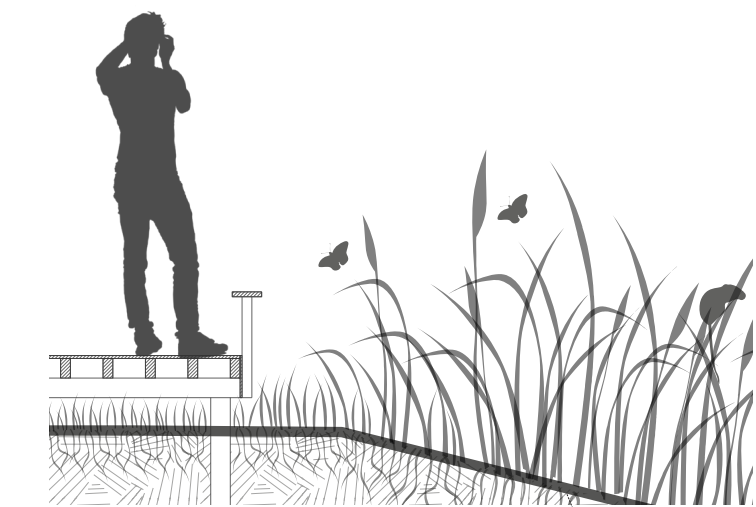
DETAIL DITCH FARMLAND: NEW (LEFT) AND CURRENT (RIGHT) 1:50
